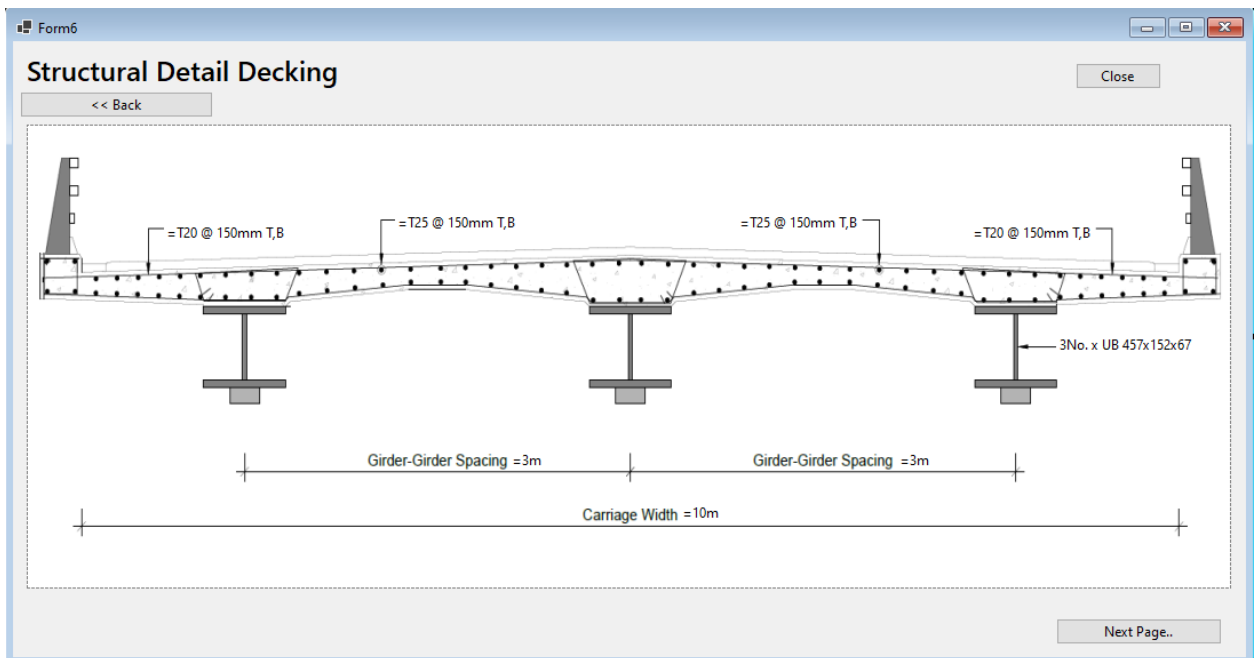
Form VII – Cross Section Structural Detail of Decking
